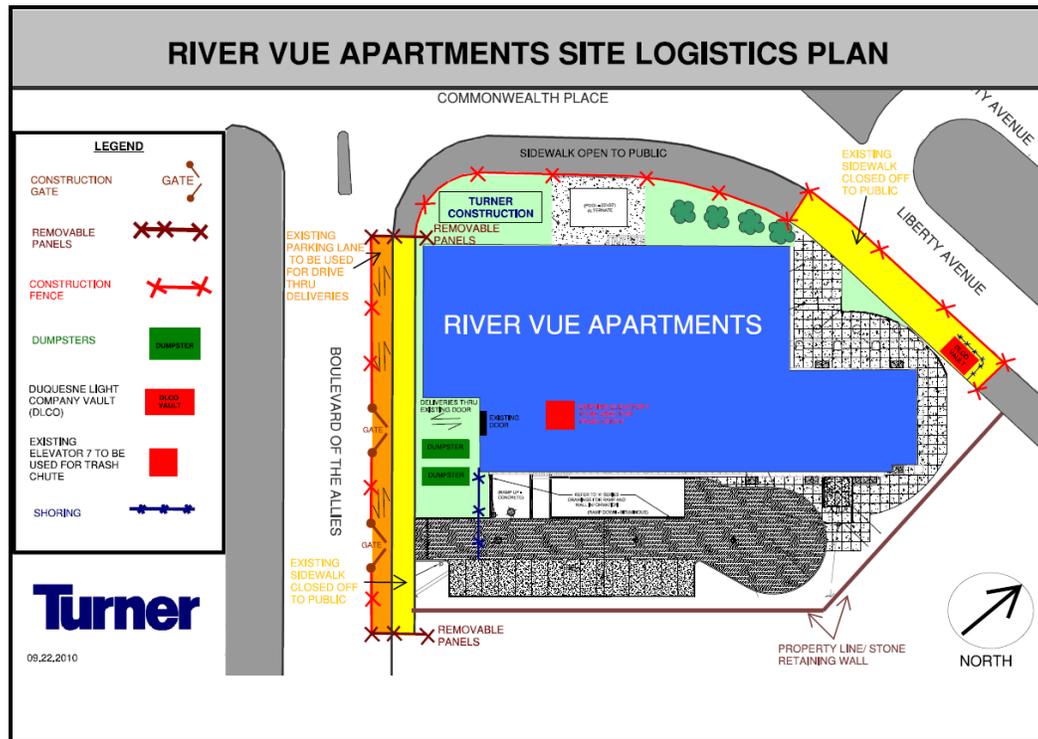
Turner Construction Company’s Site Logistics Plan for River Vue Apartments
